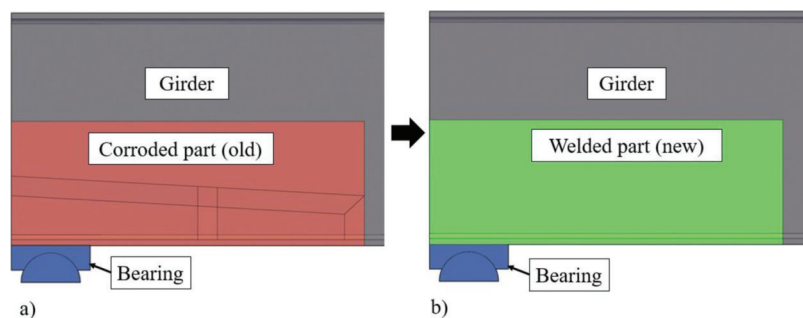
Conventional repair method: replacing the corroded part by welding (a) before repair, and (b) after repair.
